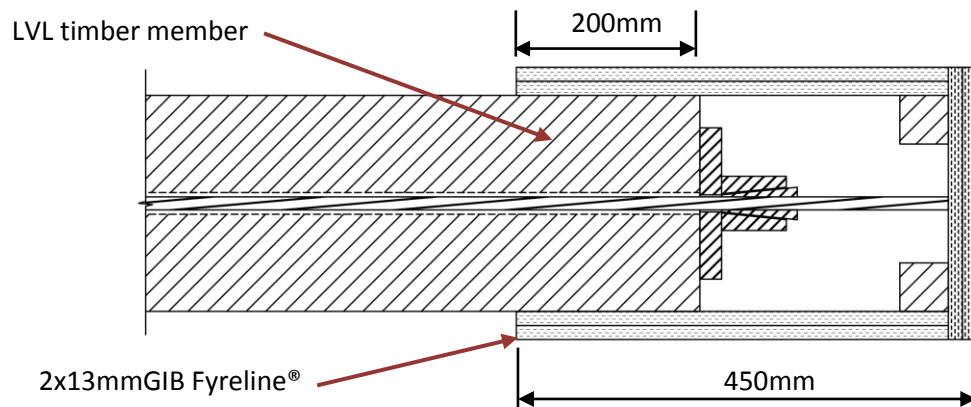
GIB board protection for post-tensioning anchorage longitudinal section drawing.
